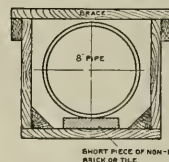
SECTION OF WOODEN FORM USED FOR APPLICATION OF ASPHALT OR CONCRETE COATING
